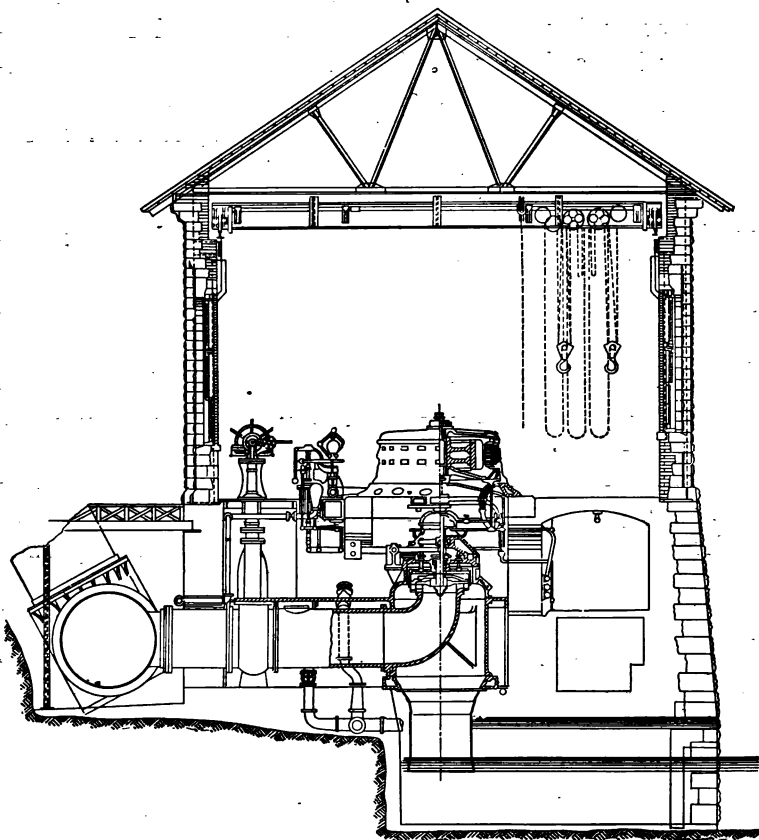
CROSS-SECTION OF POWER-HOUSE.
